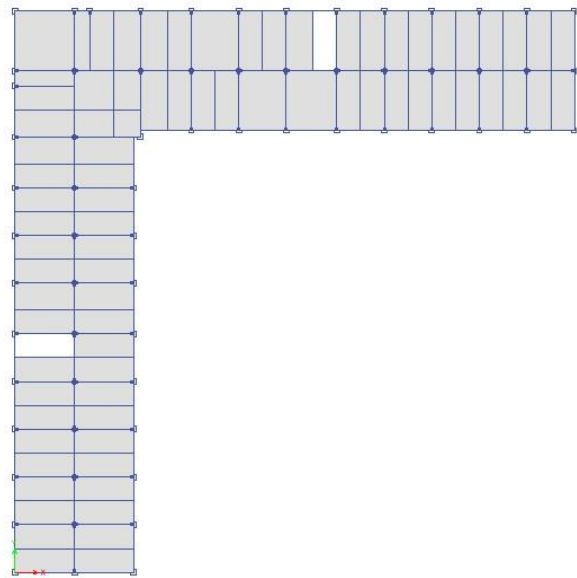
Plan View of G+ 7 Model with Specially Shaped Columns
